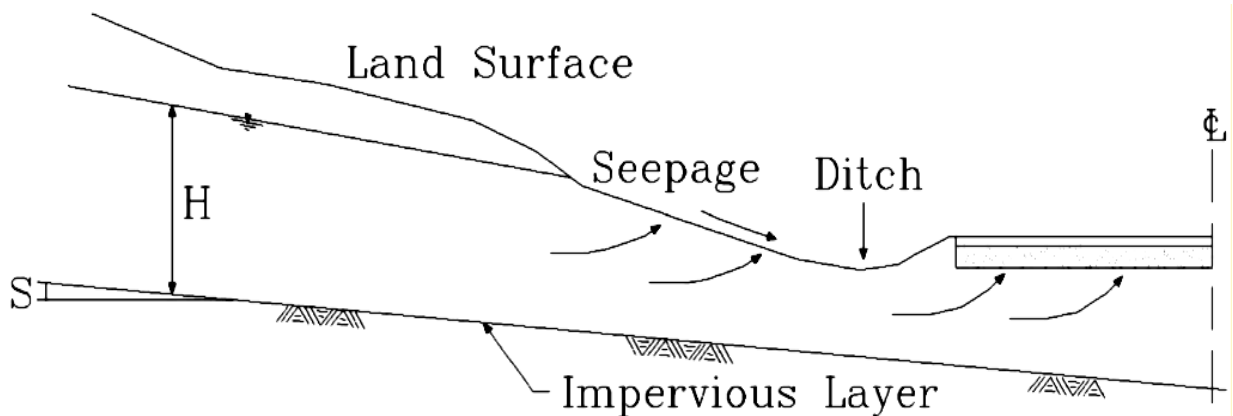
Illustration of ground water flow along a sloping impervious layer toward a roadway. Ground water seeps through the slope where the water table intersects the land slope, and ground water flows beneath the pavement while also entering the pavement foundation materials.
